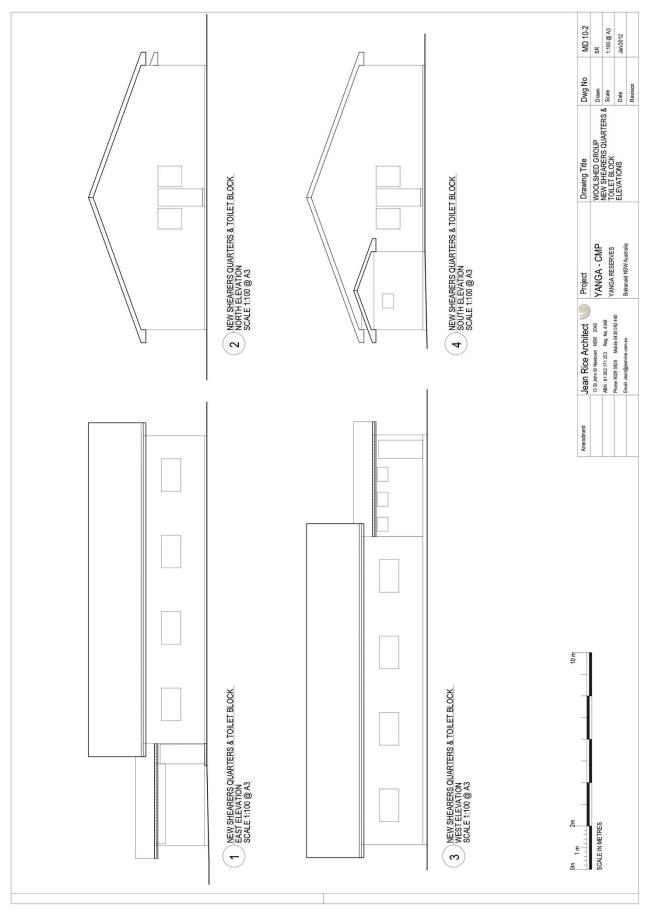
Woolshed Group New Shearers Quarters elevations. Jean Rice Architect, site assessment 2009.
